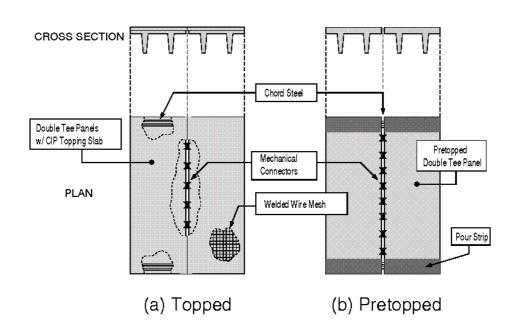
Precast joint details (a) topped diaphragm; (b) untopped diaphragm (after Farrow, 2002)
